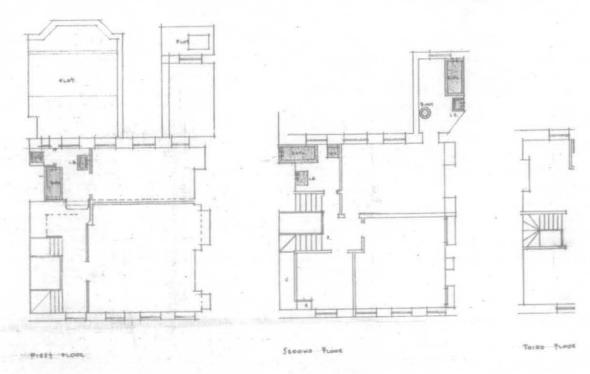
Plans of interior in 1951 (Drainage Plan, RBKC)
